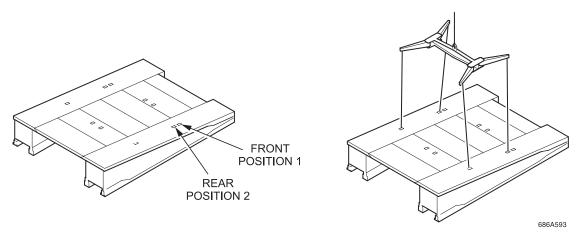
Bridge Lifter Fitted to POSITION 2 of Ramp Module
